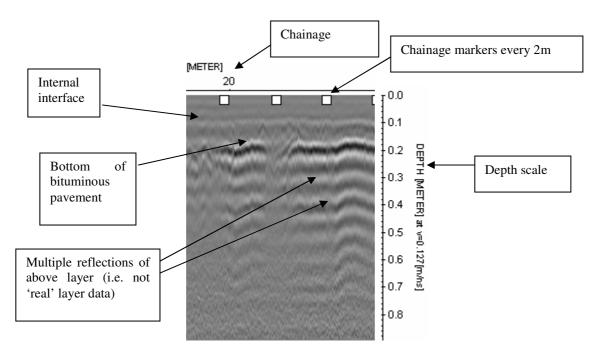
GPR Profile of bituminous pavement over hand pitchings (note loss of resolution in pitchings layer)
